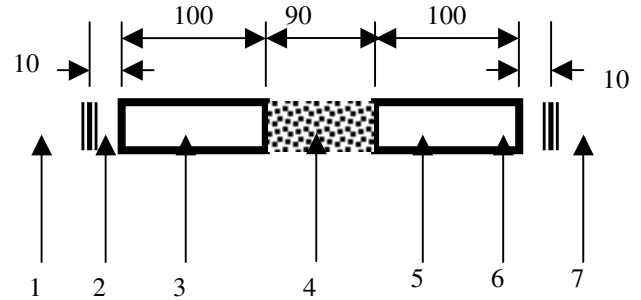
Cross section of a wall construction #2 with added insulation. (all dimensions in mm)
